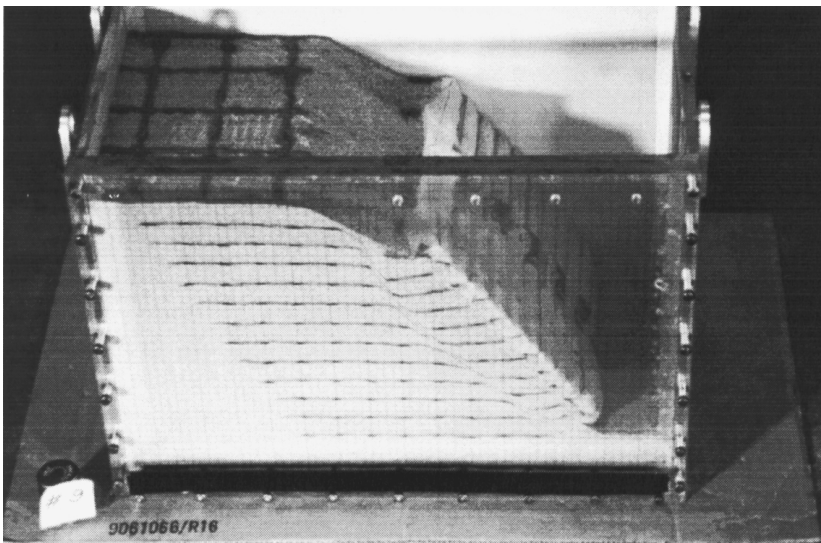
Reinforced slope model brought to failure by increasing the unit weight of the backfill.
